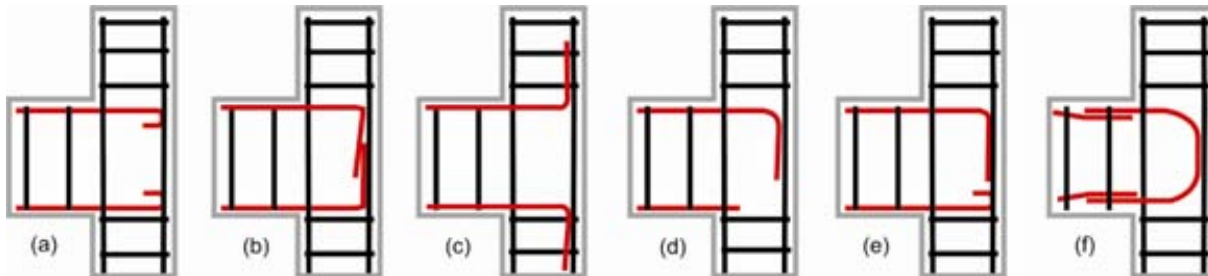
Varieties of non-ductile beam-column joint detailing: a) double 180° hooks, b) double 90° inward bends, c) double 90° outwards bends, d) early straight length termination for bottom beam bars, e) combination of 90° and 180° anchorage, and f) U-shaped bar.
